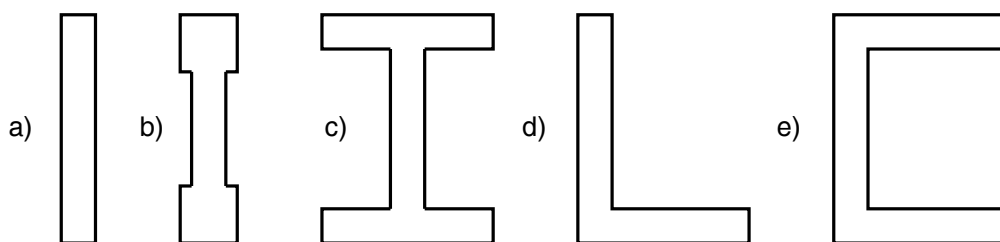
Typical wall sections: a) rectangular, b) barbell, c) flanged, d) L-shaped and e) C-shaped.
